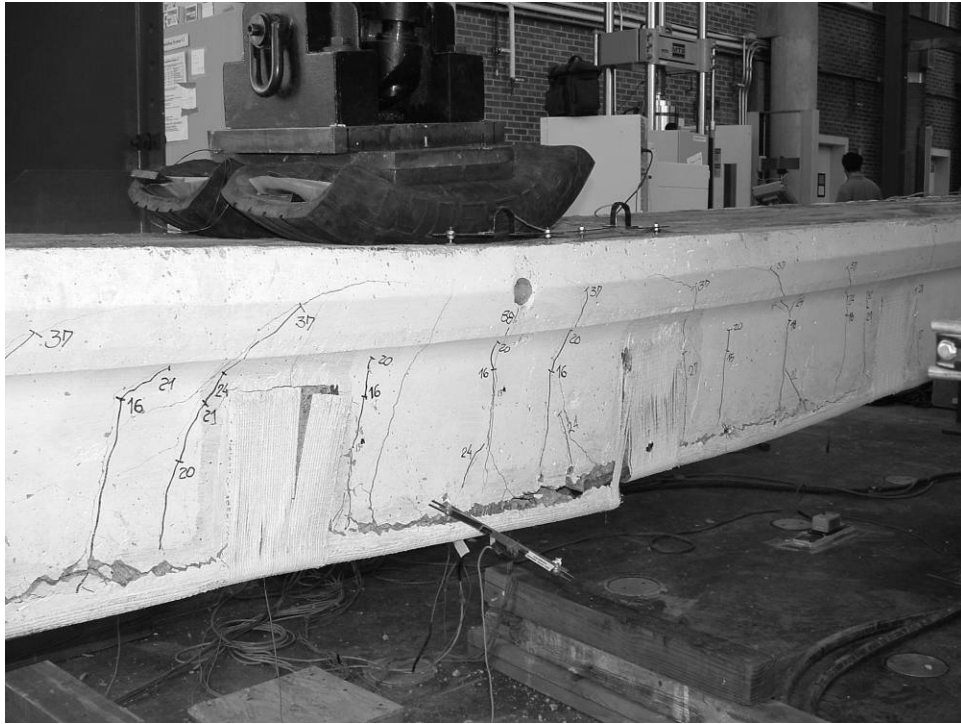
Failure due to rupture of CFRP sheets in girder EB4
